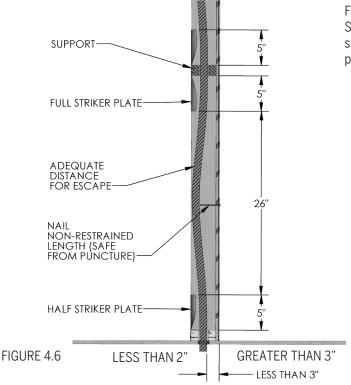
Typical locations where striker plates are required. Striker plates are installed at both horizontal penetrations unrestrained vertical runs of 26 inches or greater require no additional protection.
